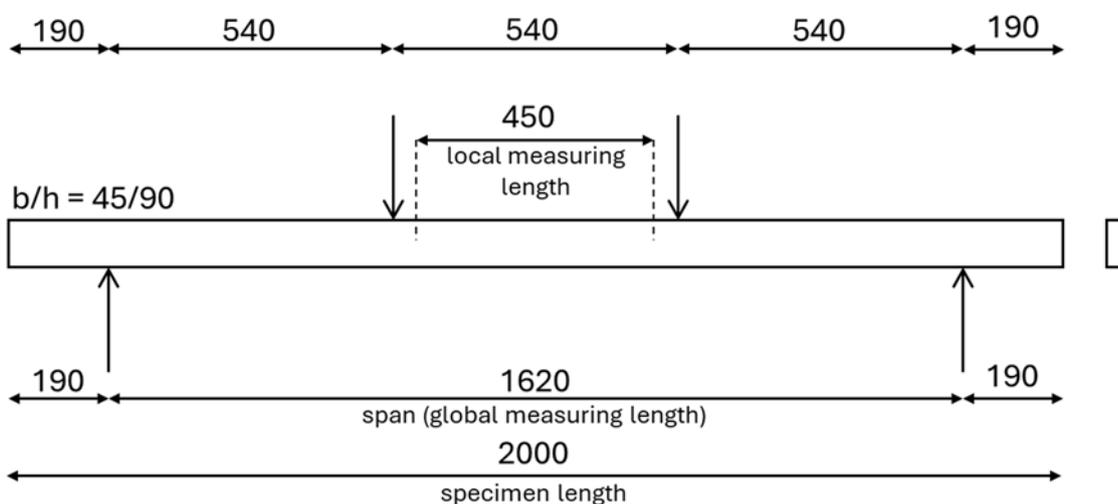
Test setup and dimensions of the bending test specimens in [mm]
